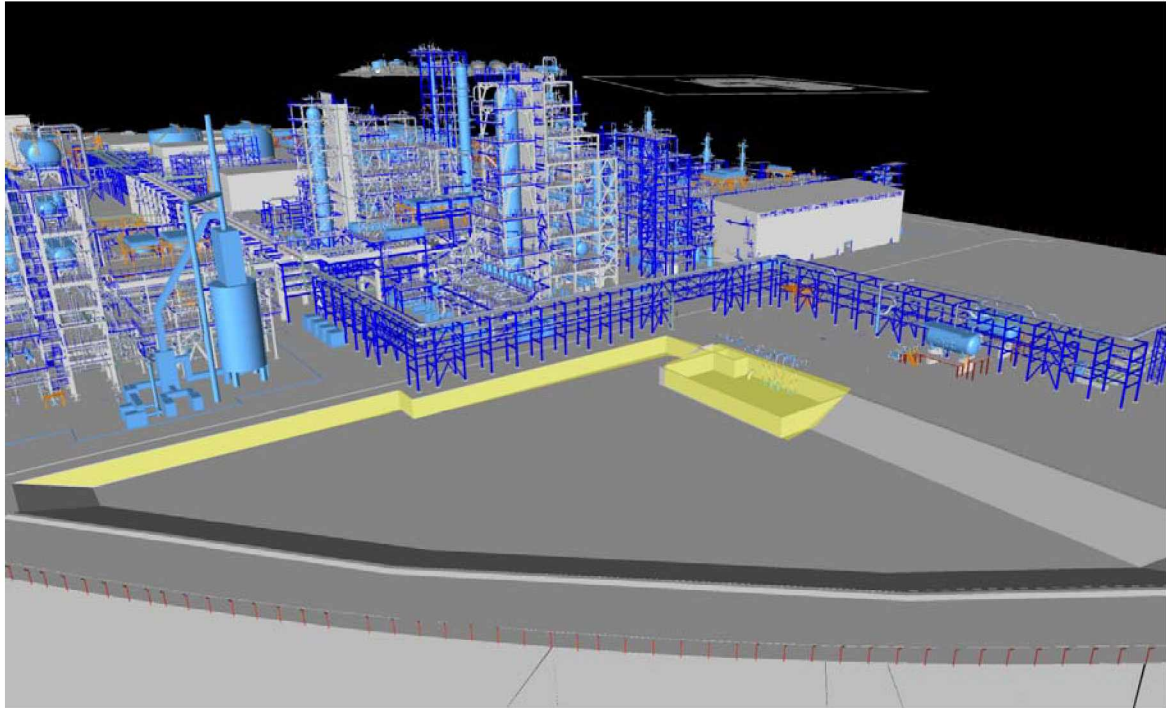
Concrete for Unit 062 Storm Water Pond (Wall and Basin)
